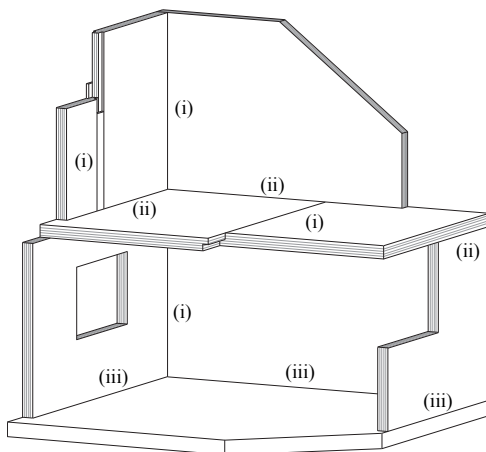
joints in a CLT structure – (i) wall-to-wall or floor-to-floor joints, (ii) wall-to-floor joints and (iii) wall-to-foundation joints; from Brandner et al. (2016)
